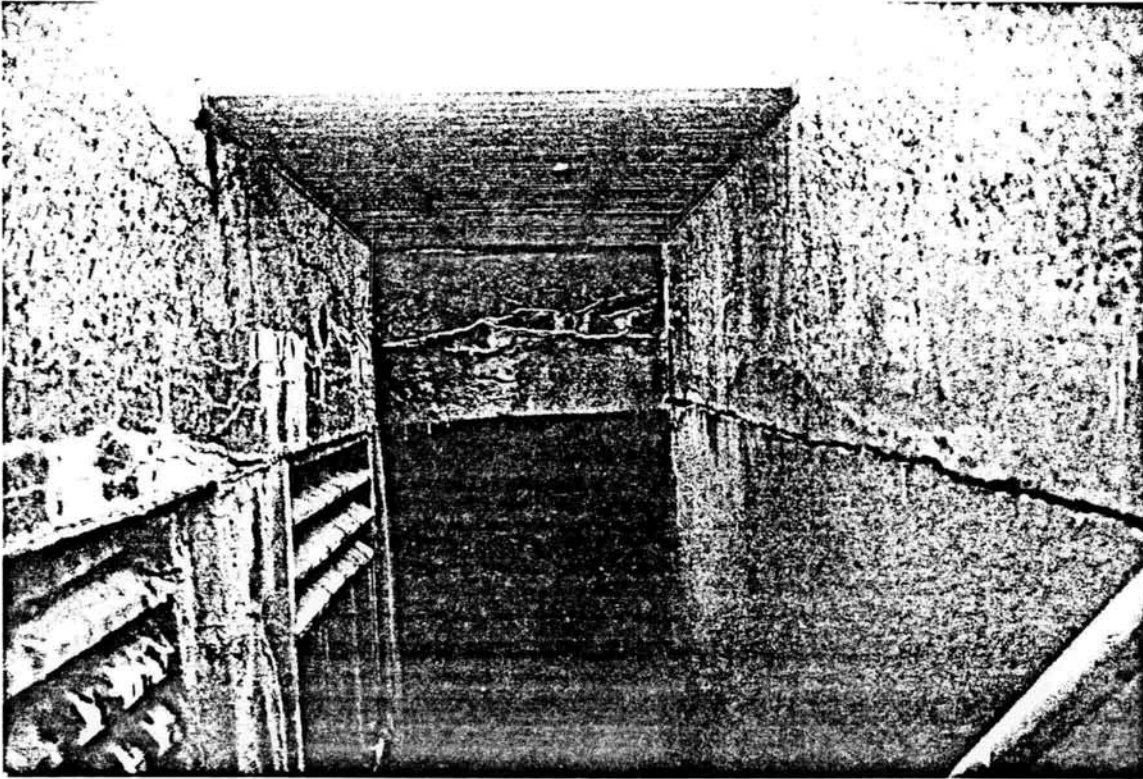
View of areaway for stair to underground service area. Infiltrating water has caused concrete to crack. Metal louvers covering openings to the mechanical room have corroded.
